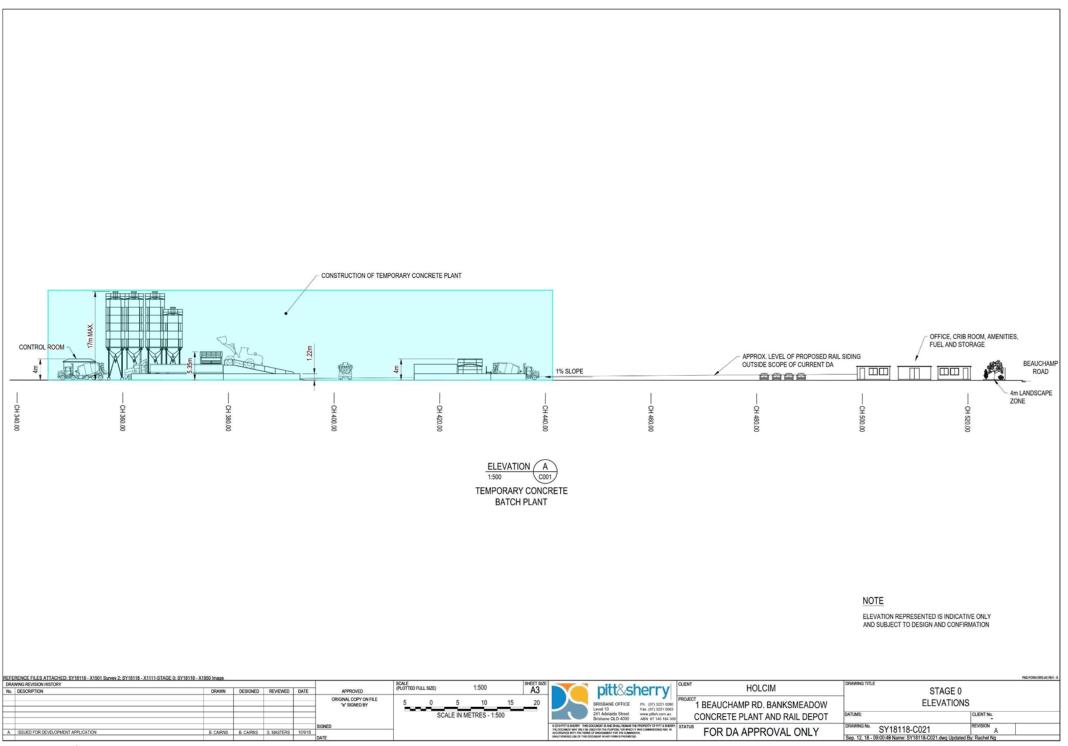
Stage 0/1 Elevations (Subject to Detailed Design)
